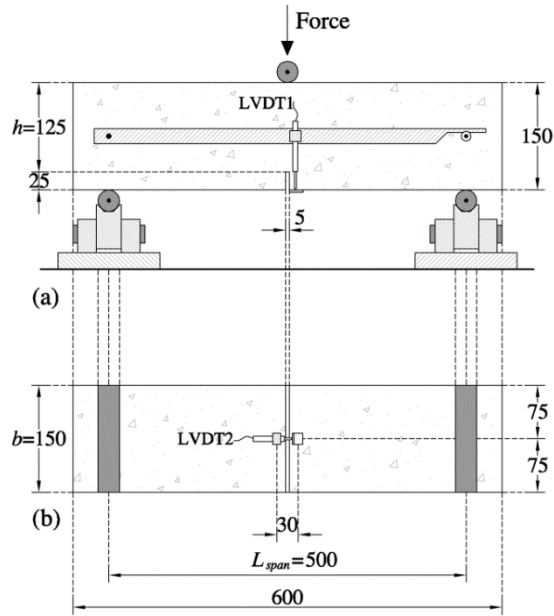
(a) front side and (b) bottom side of the notched beam (dimensions in mm)
